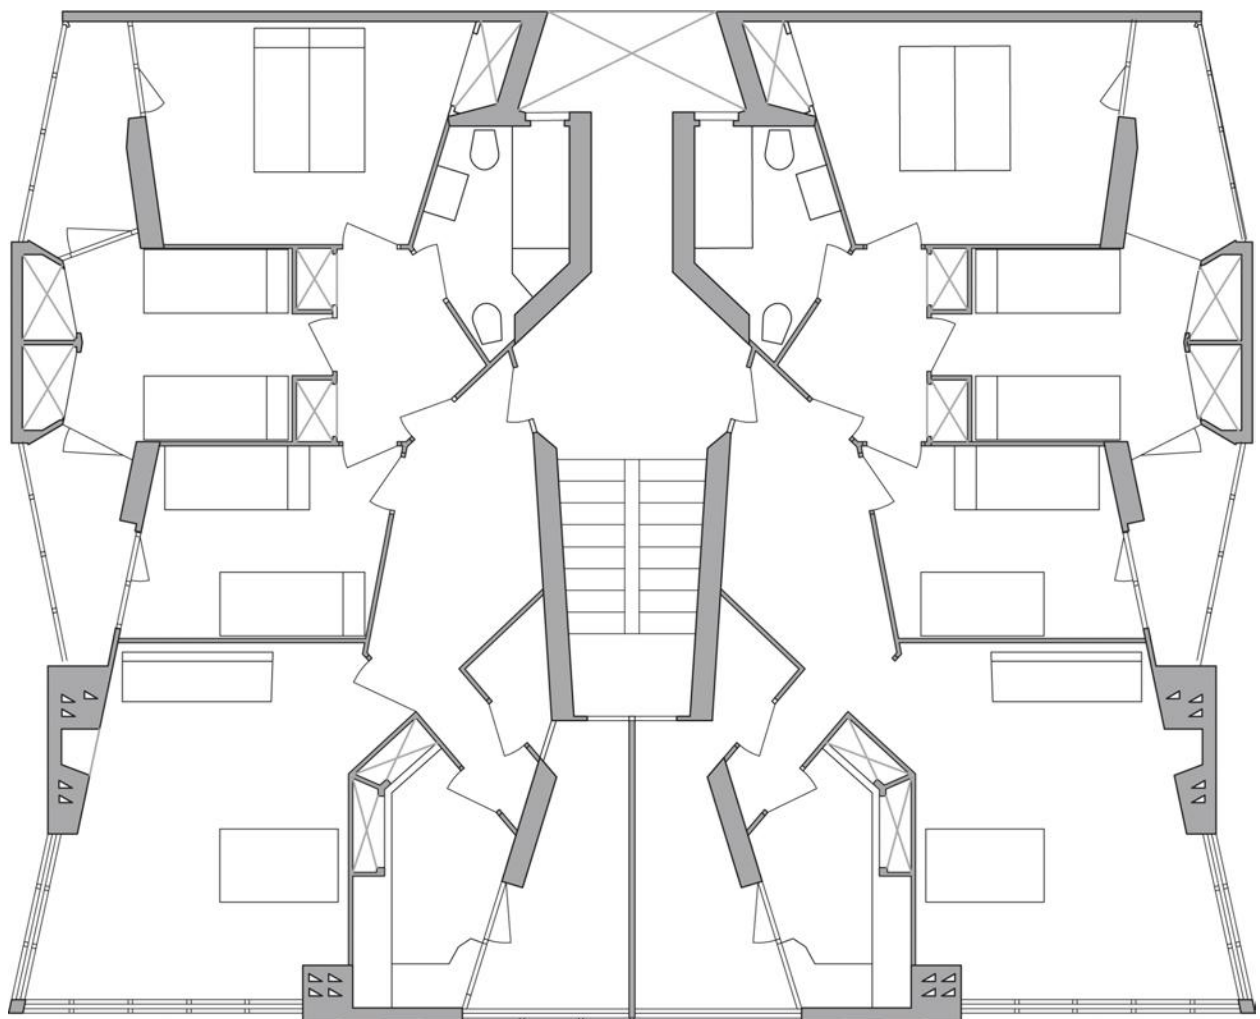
José Antoni Coderch. ISM building (1953). Typical plan. Redraw by the author.
